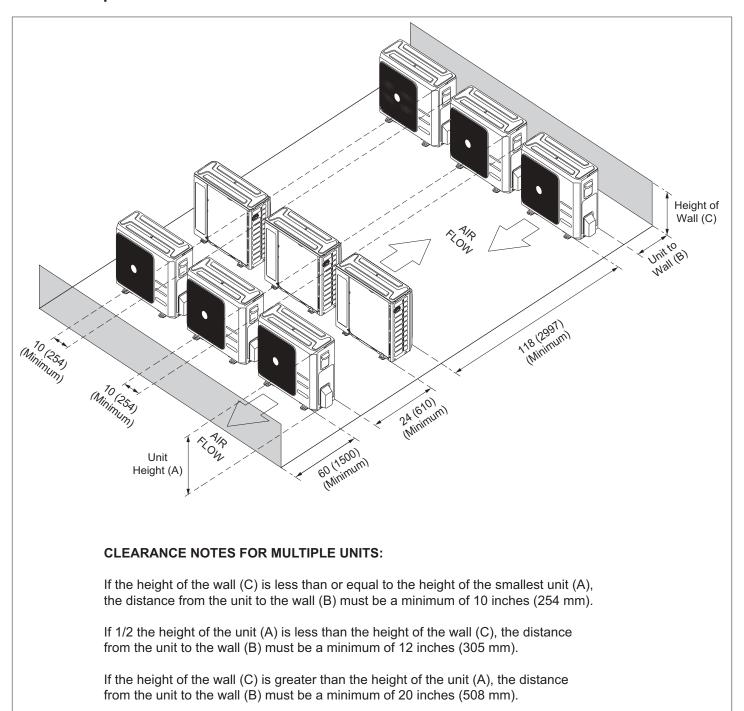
Multiple Outdoor Unit Clearances - Inches (mm)
